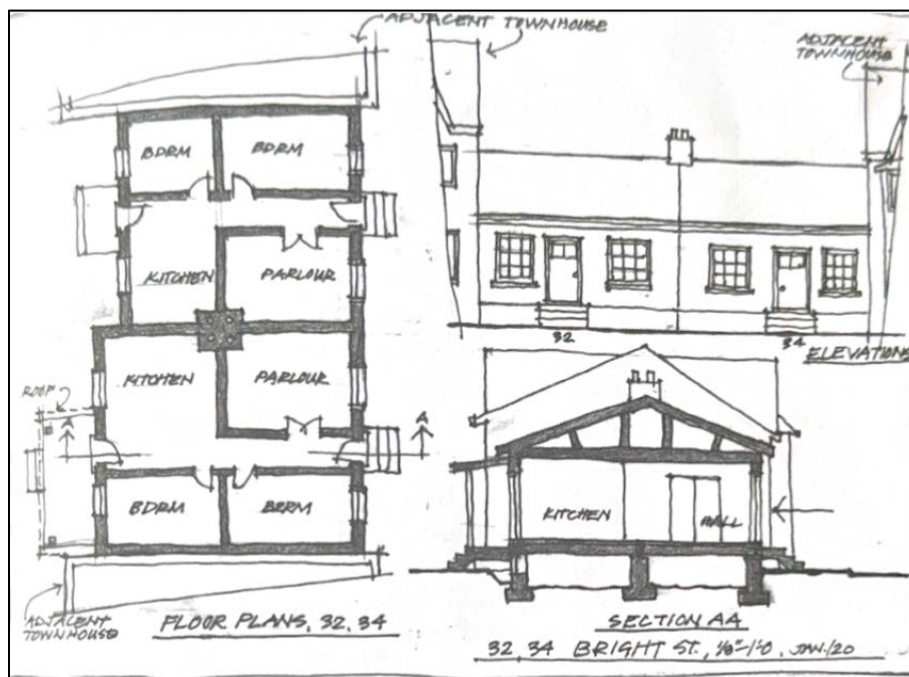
Plan, section, and elevation of 32 and 34 Bright Street. Don Loucks and Leslie Valpy, Modest Hopes, 185.
